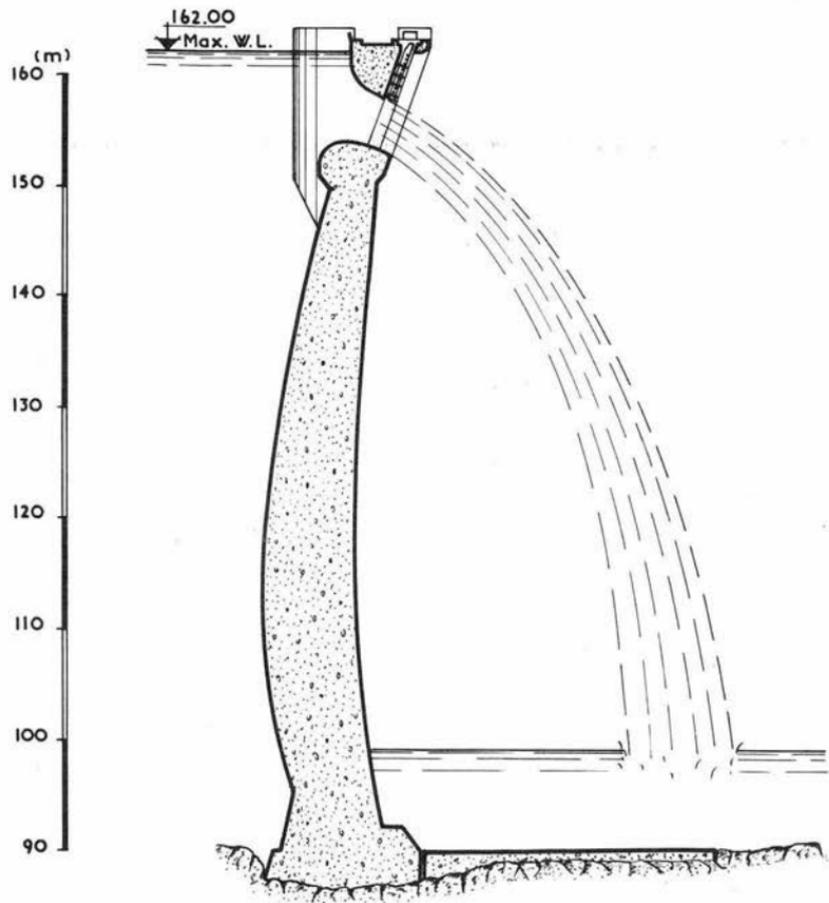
CANIÇADA — CENTRAL PROFILE OF THE DAM AND SPILLWAY
